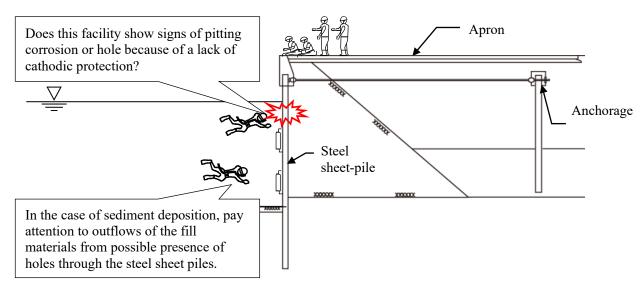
Diagram of inspection of steel sheet-pile
